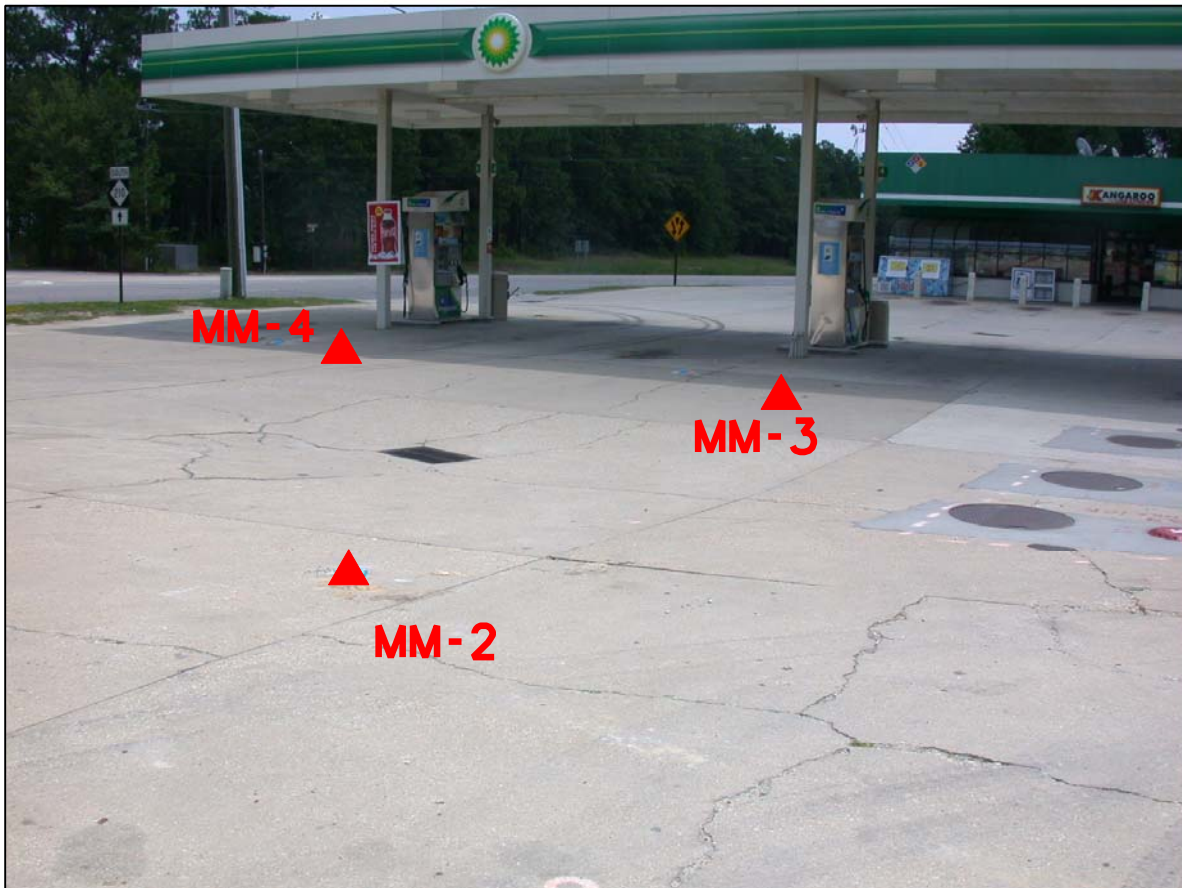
BORINGS IN PROPOSED R/W LOOKING SOUTHEAST
